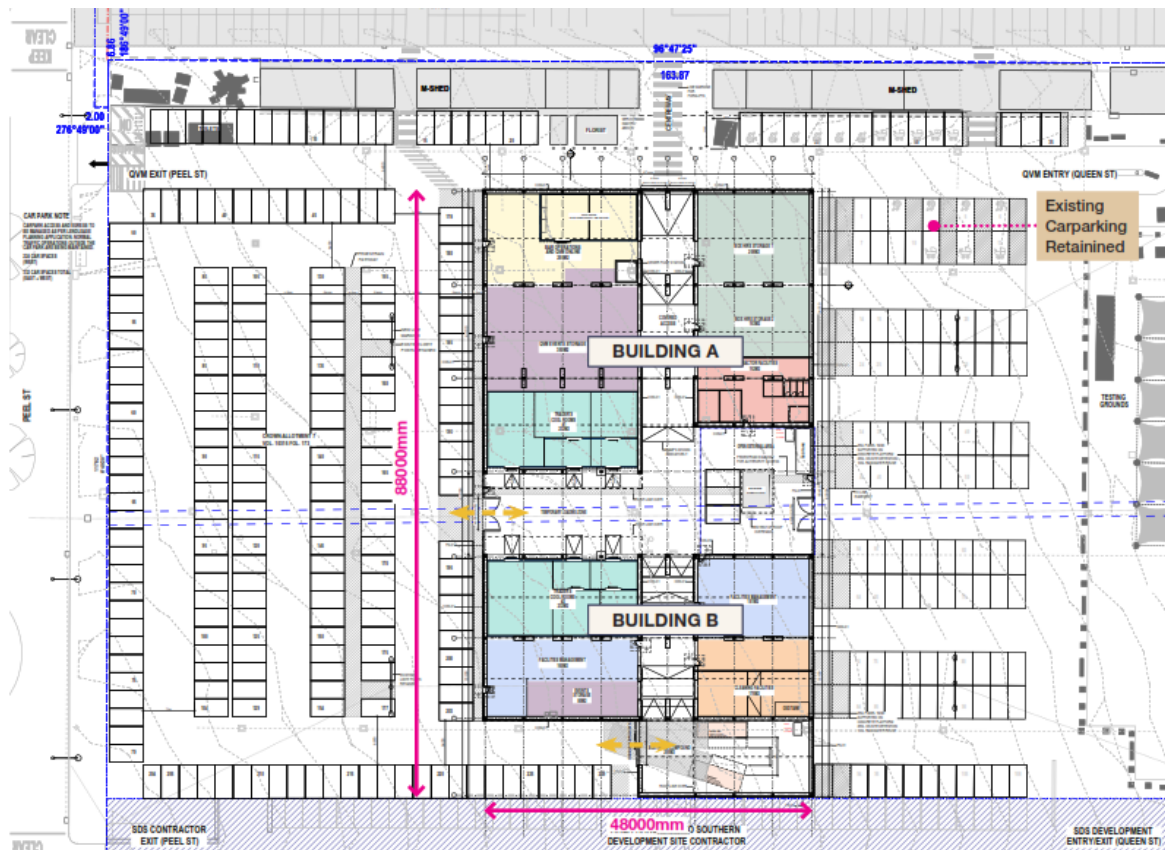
Proposed floor plan. *Source:* NH Architecture & Searle x Waldron Architecture, November 2023.
